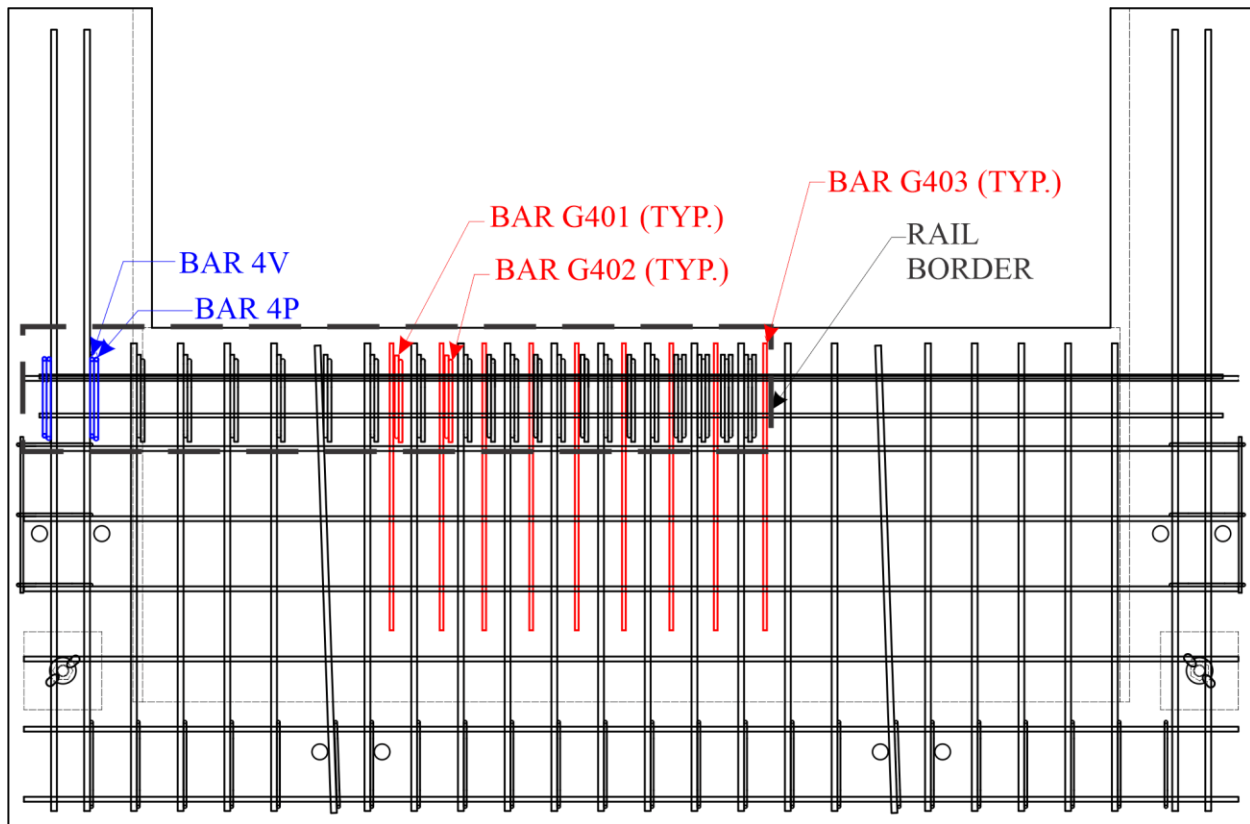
Additional rebar in GFRP EOR test 2 specimen (plan view of deck and rail reinforcement shown)
